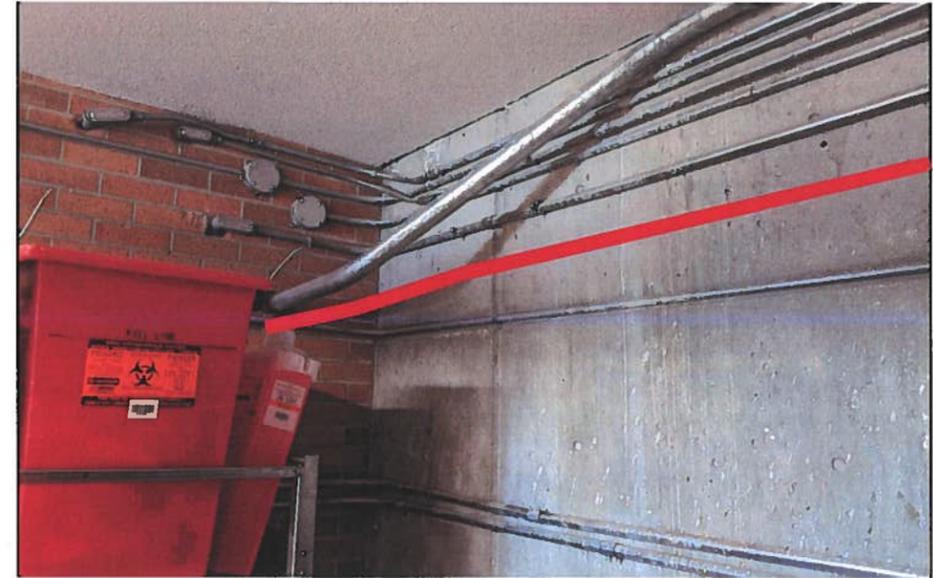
PROPOSED PATH THROUGH STORAGE ROOM ALONG EAST WALL BENDING OUT 15° TO WALL PENETRATION INTO SERVER ROOM WALL. (FACING NORTHEAST) - SECTION D-D
